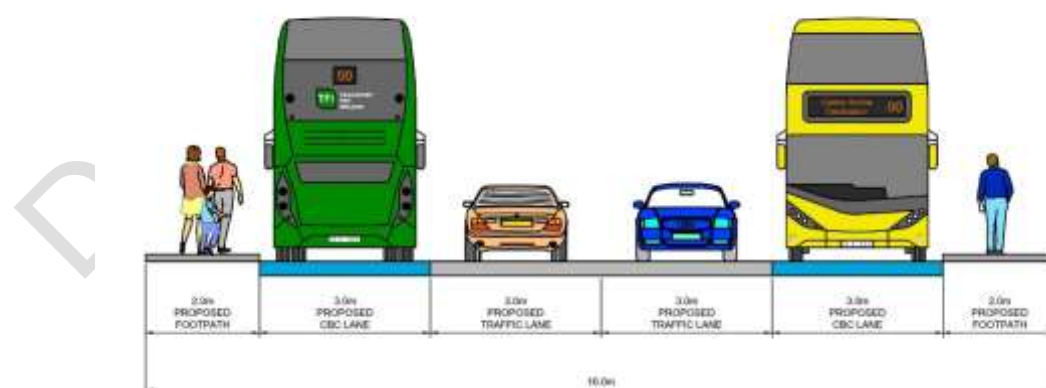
Typical Cyclist Absent Cross Section (A-A)
